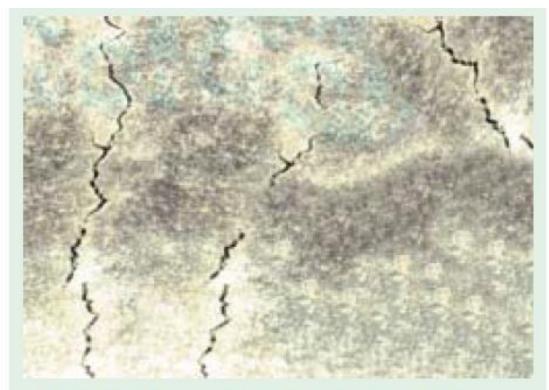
Cracks on concrete surface due to inadequate curing.
